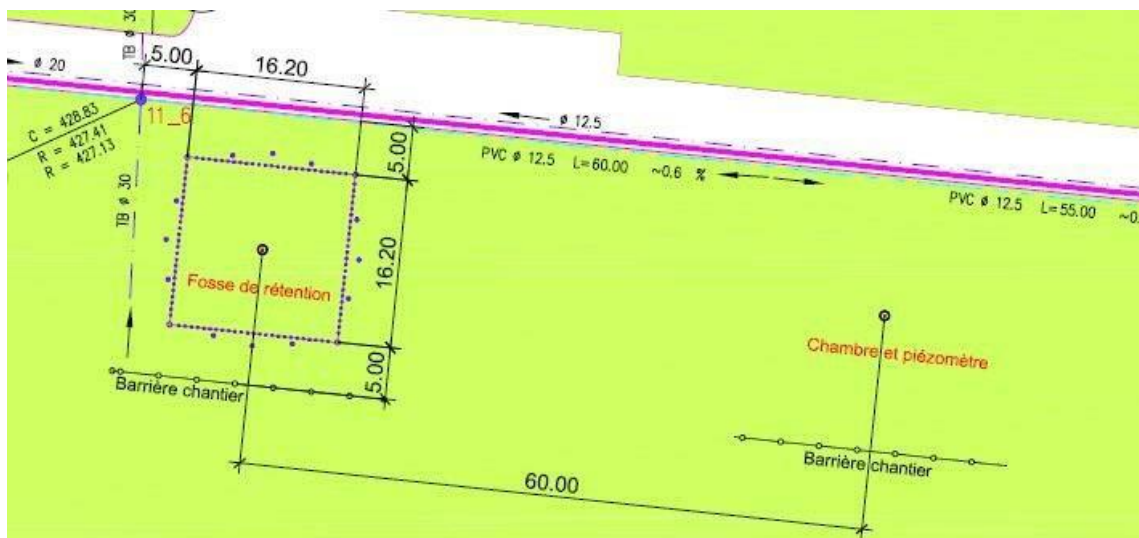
Test study layout adjacent to taxiway at GIA (GADZ 2014).
